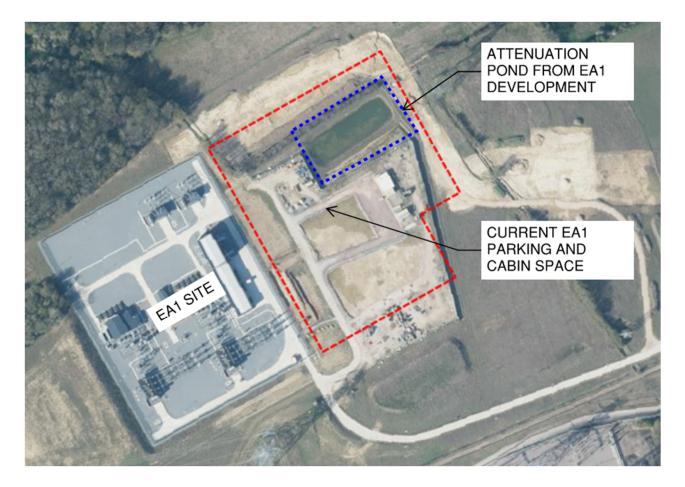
Existing Site Land Use (Site Boundary outlined in Red)
